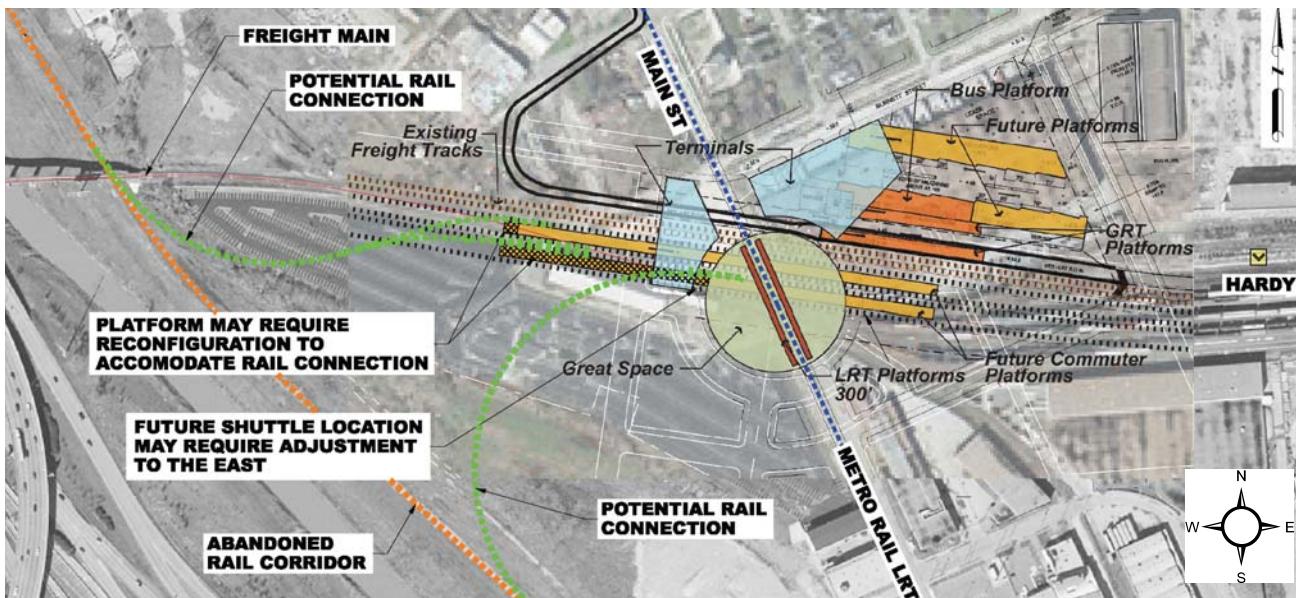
North Intermodal Terminal Concept Plan (Aerial View)
